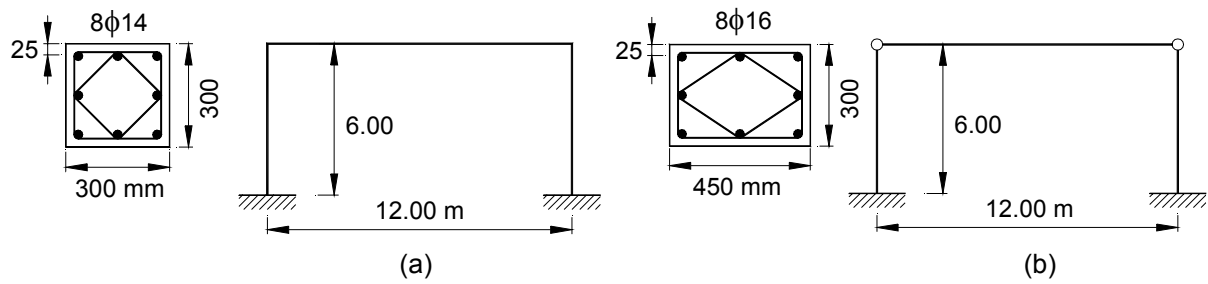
Scheme of the frames and details of the reinforcement: (a) monolithic arrangement; (b) hinged arrangement.
